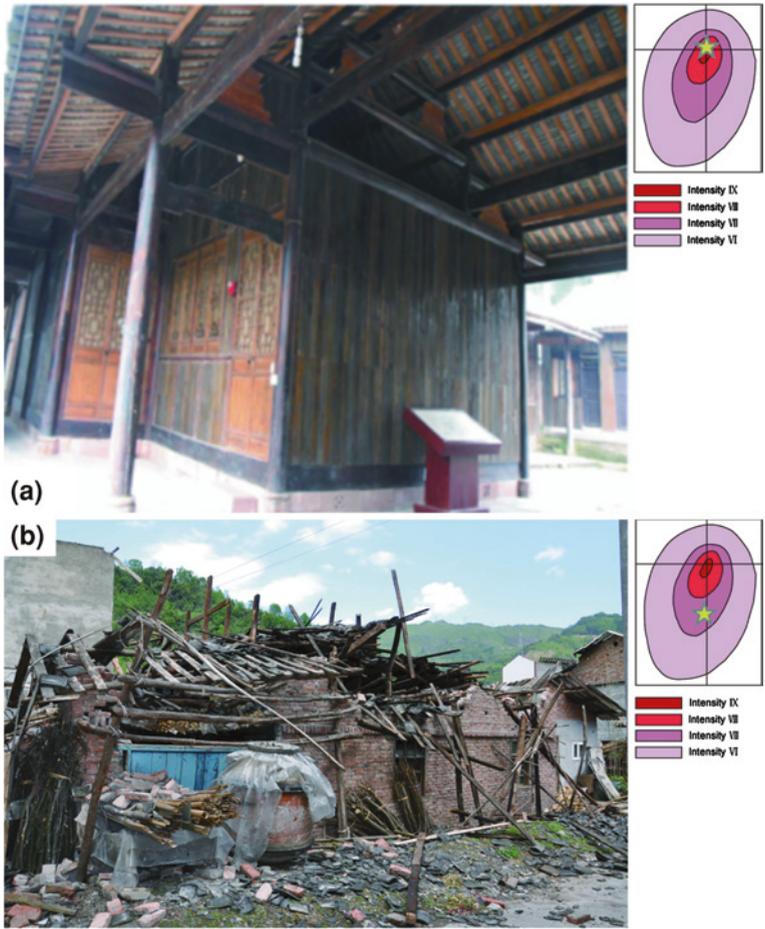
Damage of wooden structures. a A traditional wooden structure at Gaohe County which performed well during the earthquake, picture from Gao et al. (2013). b A collapsed wooden structure at Rongjing County which was infilled with brick wall
